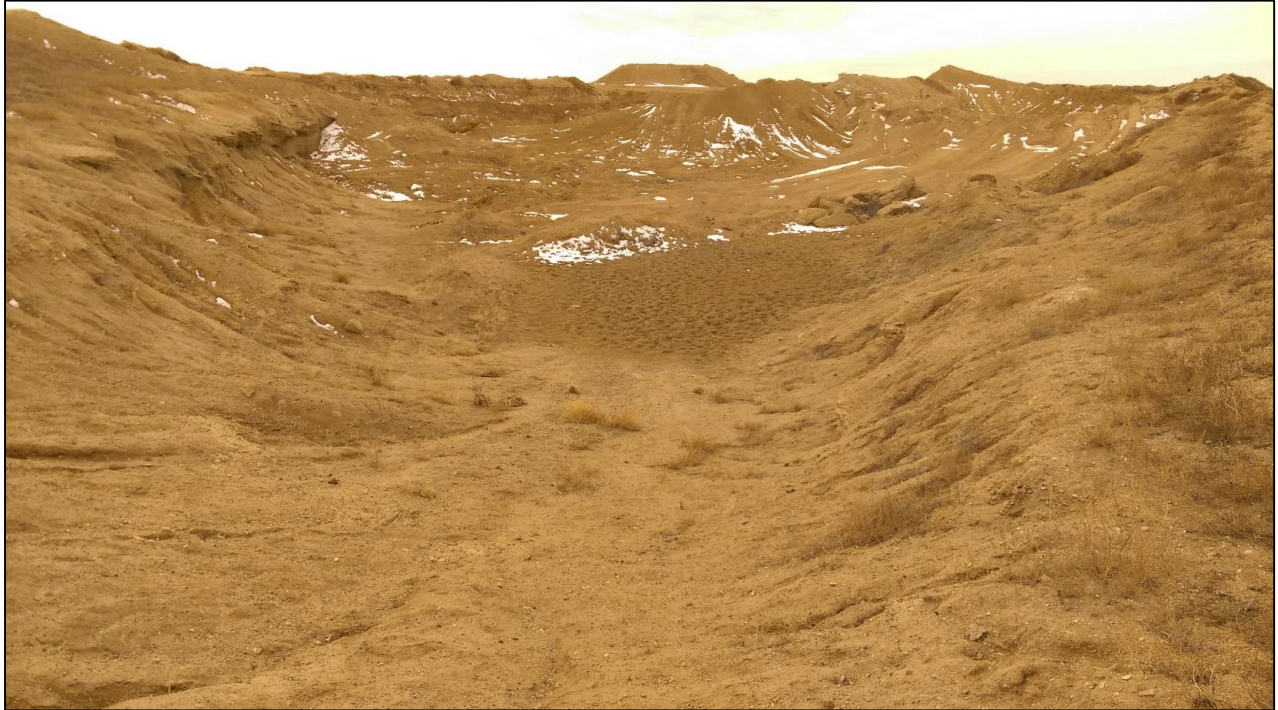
View looking south across active pit located in northwestern portion of permit area. Note mined walls have slope gradients ranging from 1H:1V to 3H:1V, and appear to be stable.
